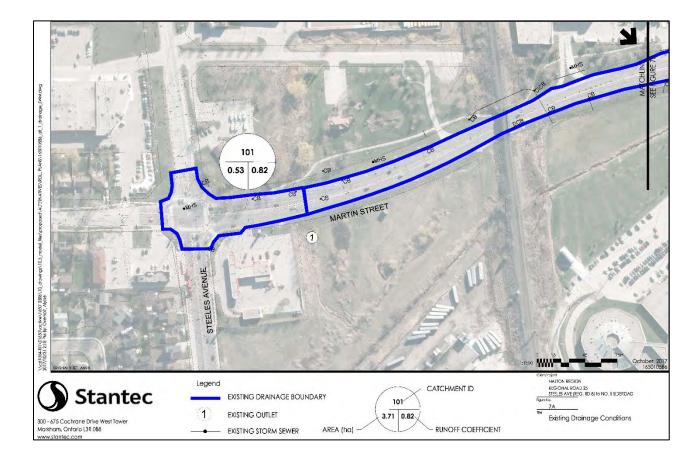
Existing Drainage Conditions (Steeles Avenue to South of Market Drive)
